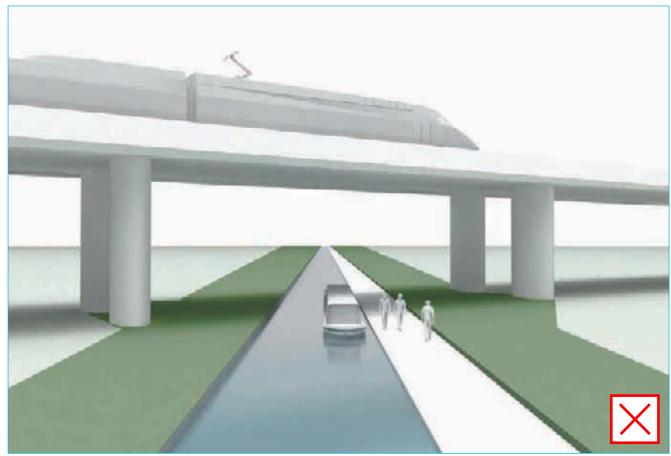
Piers aligned to the rail create 'dead' spaces for skewed crossings
